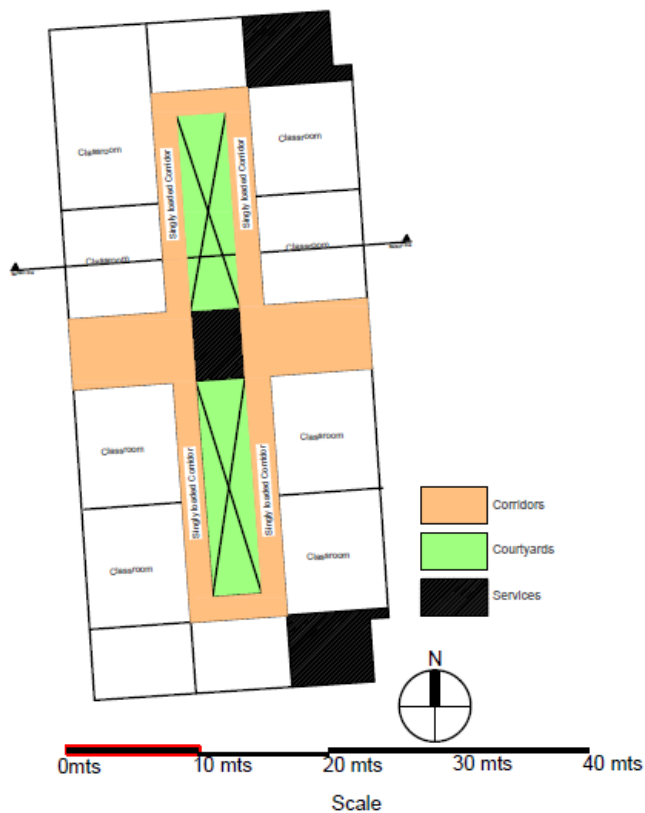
Layout plan of Case II showing the corridor & courtyard. Source: Author
